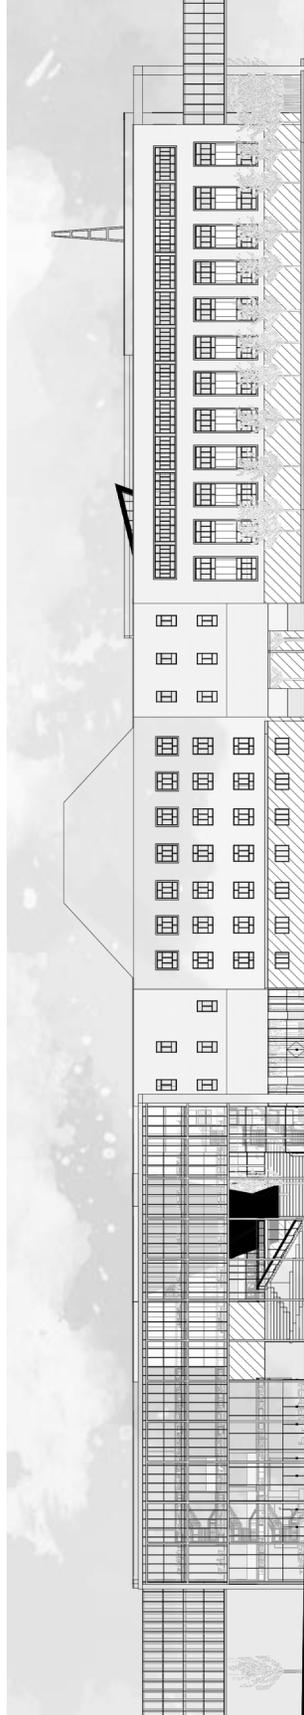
Kerr Hall South Exterior Elevation from Gould Street
